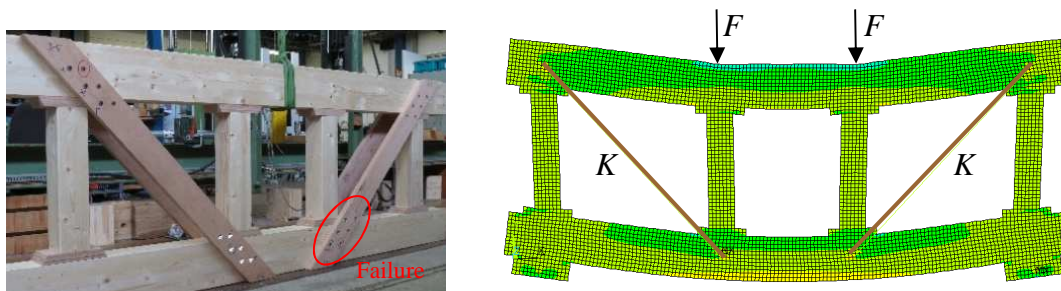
Prototype of the truss system (a) and finite element (FE) model – deformed structure (b)
